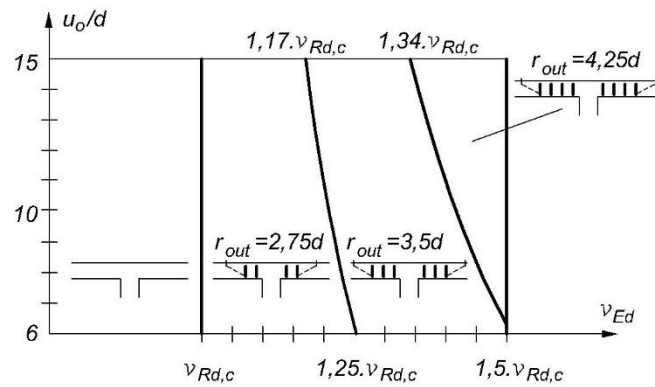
Cases of shear reinforcement for corner columns and for edge walls and wall corners
